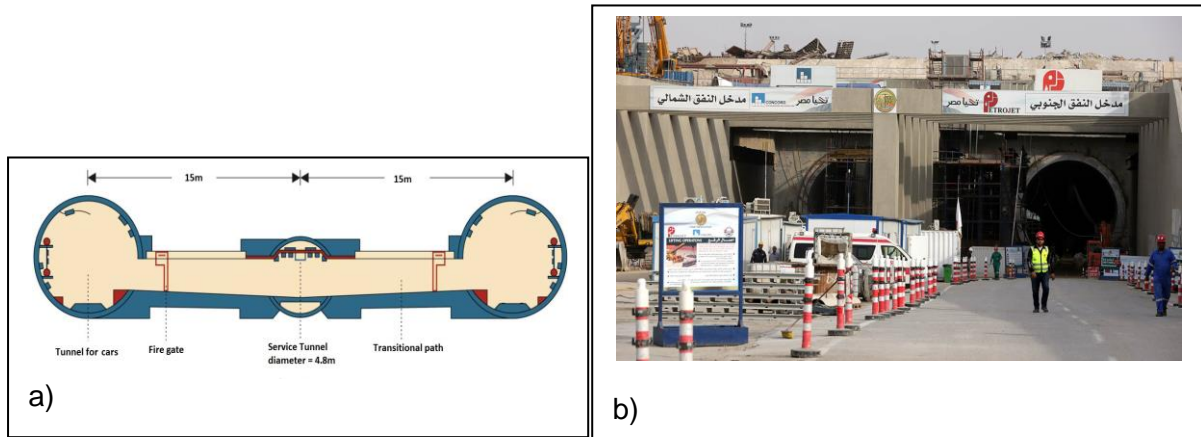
Ismailia first tunnel. a) a cross section of the tunnel; b) the tunnel during construction.
